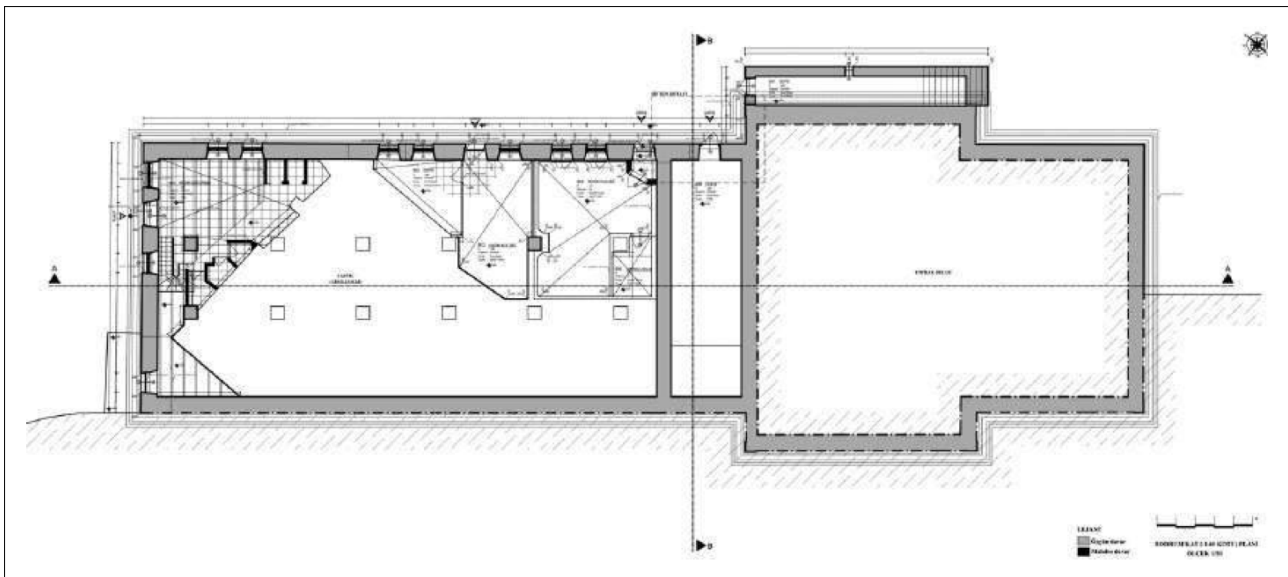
Gymnasium basement floor survey plan (Created by the Authors).
